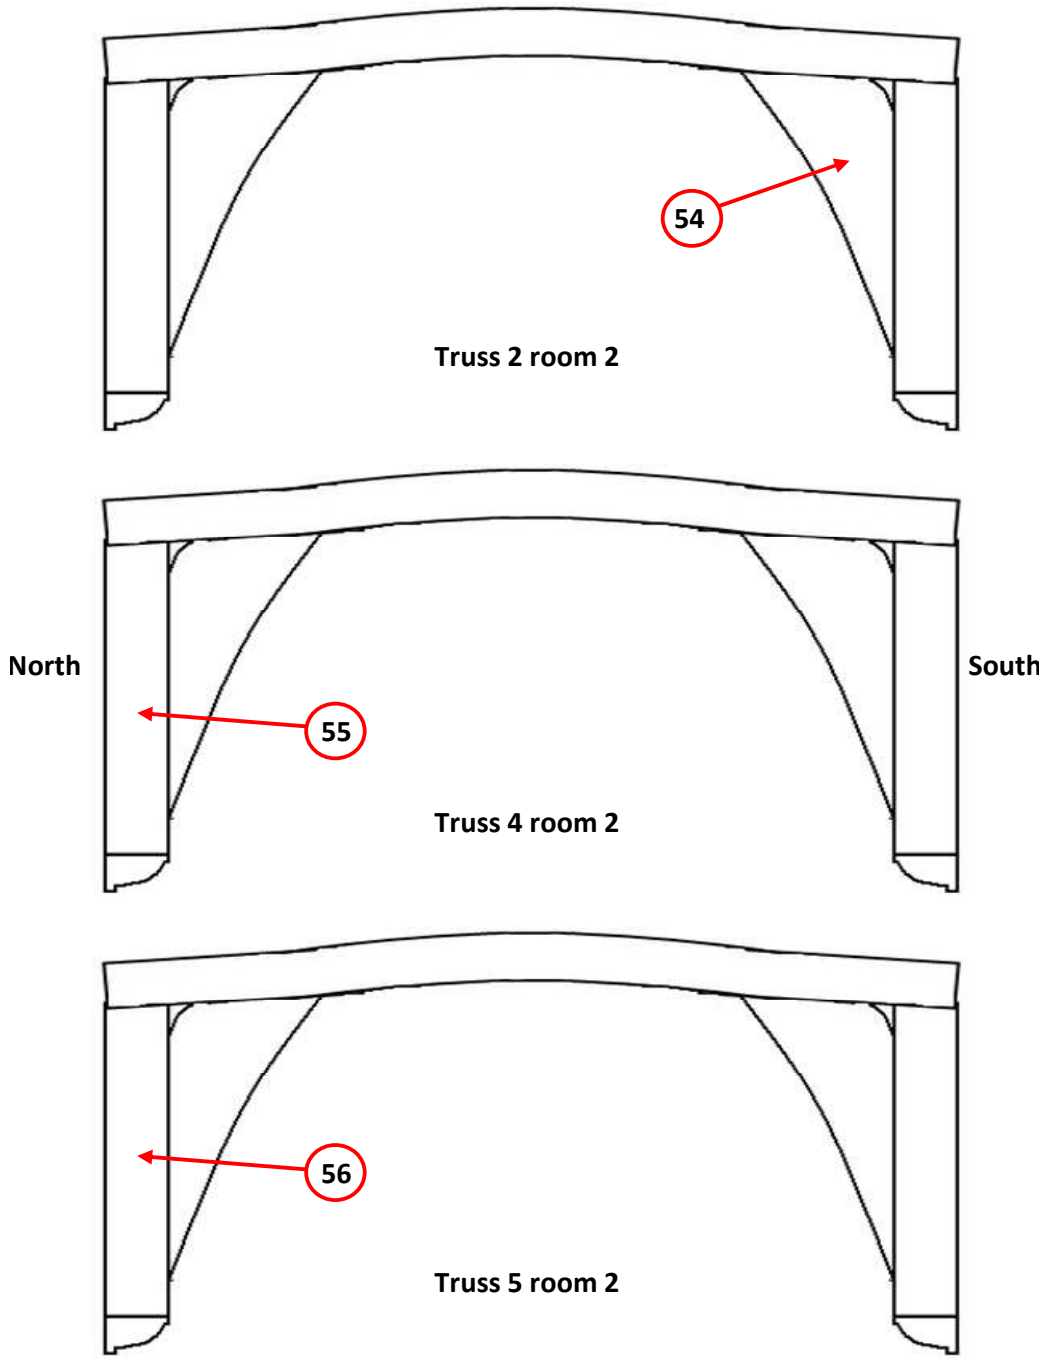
Schematic drawing through truss of the south roof of the Keep to locate sampled pine timbers
